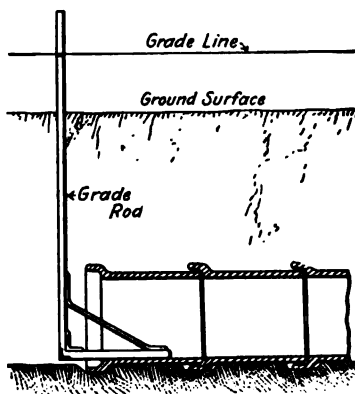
Diagram Showing the Use of the Grade Rod for Fixing the Elevation of a Sewer.
